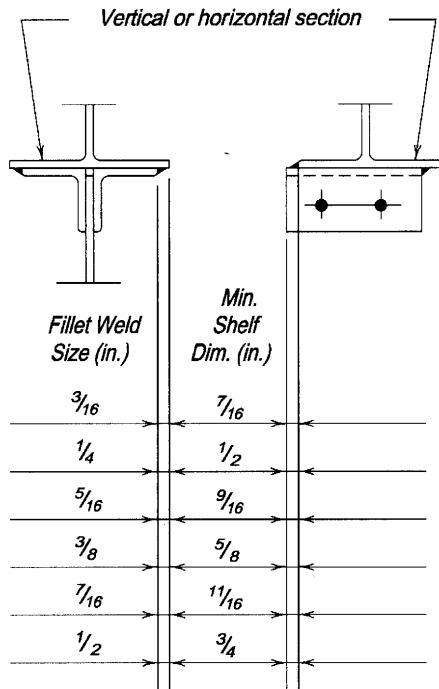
Recommended minimum shelf dimensions for SMAW fillet welds.
